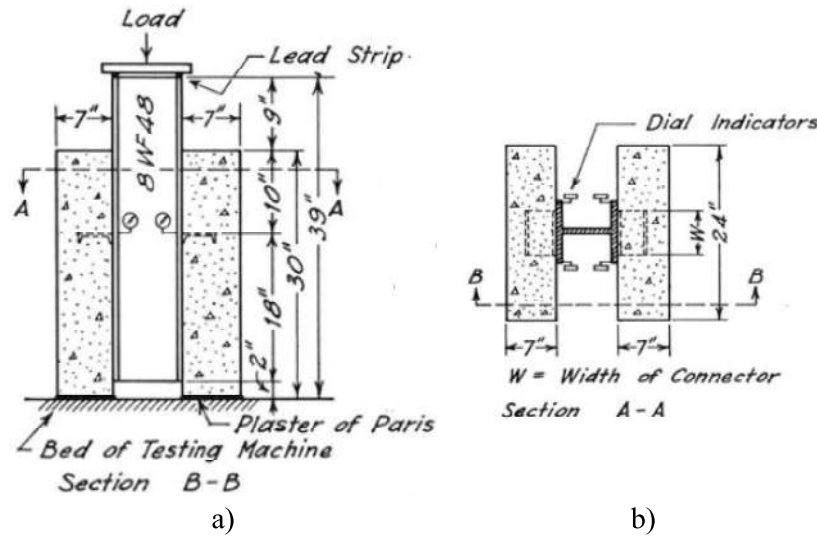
Details of push-out specimens: a) Front view and b) Cross section (taken from Viest et al. [11]).
